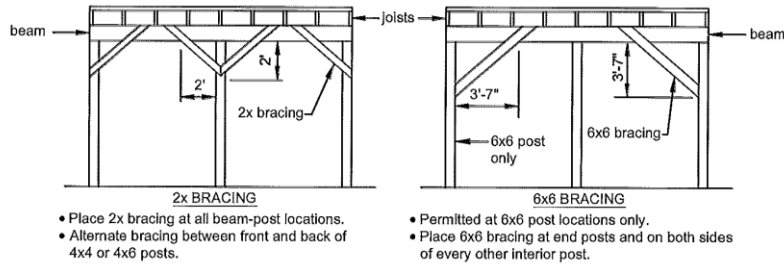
DIAGONAL BRACING AT BEAM-POST LOCATIONS
